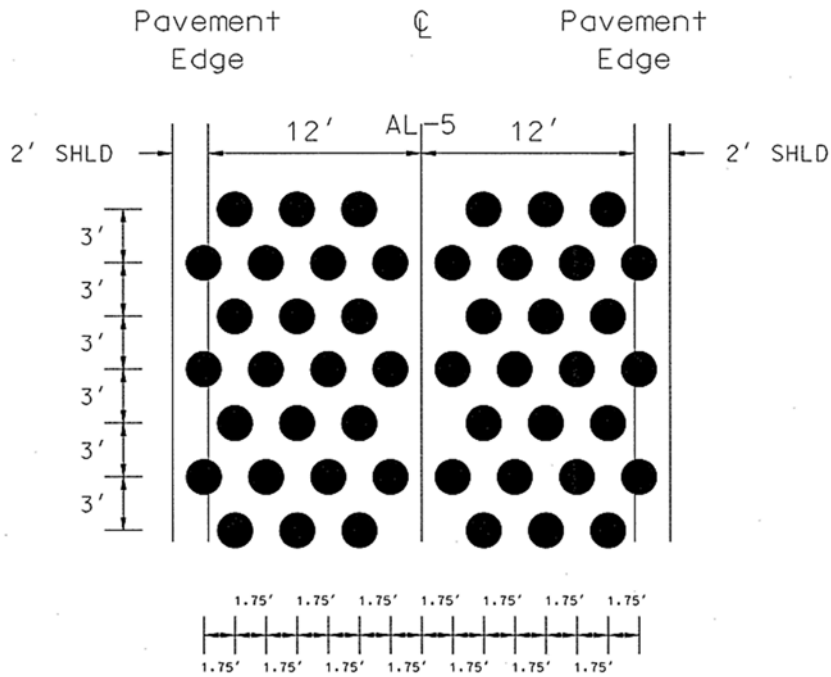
Deep Mixed Columns Plan View (ALDOT 2015)
